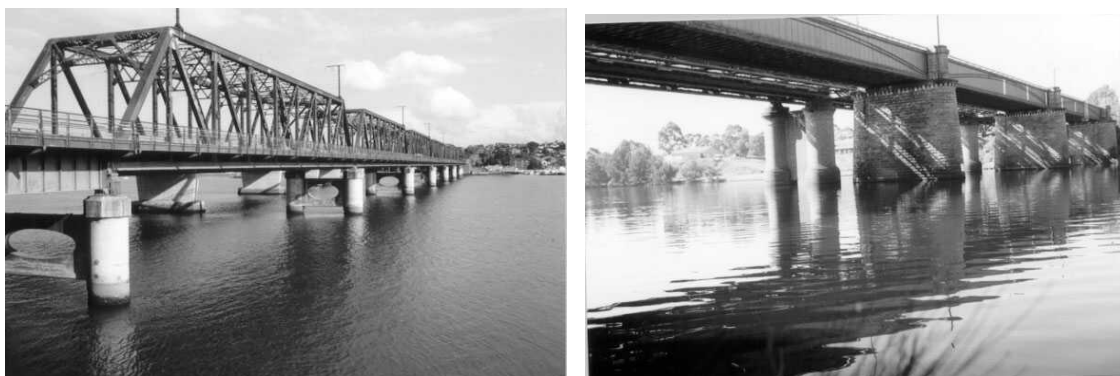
Overhead braced truss and Nepean girder, Penrith (Source: TfNSW)
